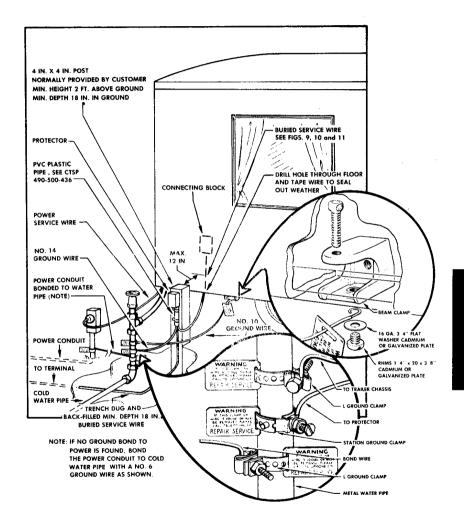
Typical Installation - Buried Distribution Water Pipe Ground
